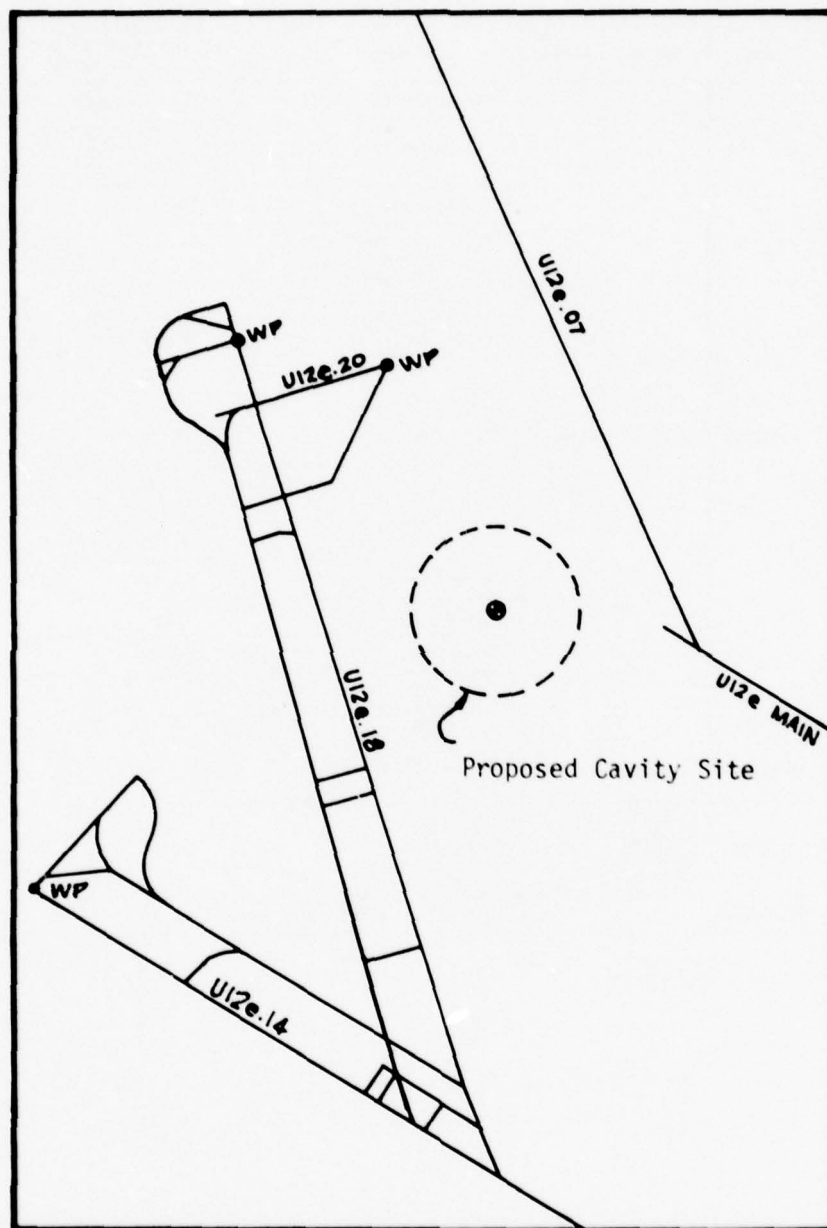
TUNNEL LEVEL LOCATION OF HYPOTHETICAL SITE IN E TUNNEL
